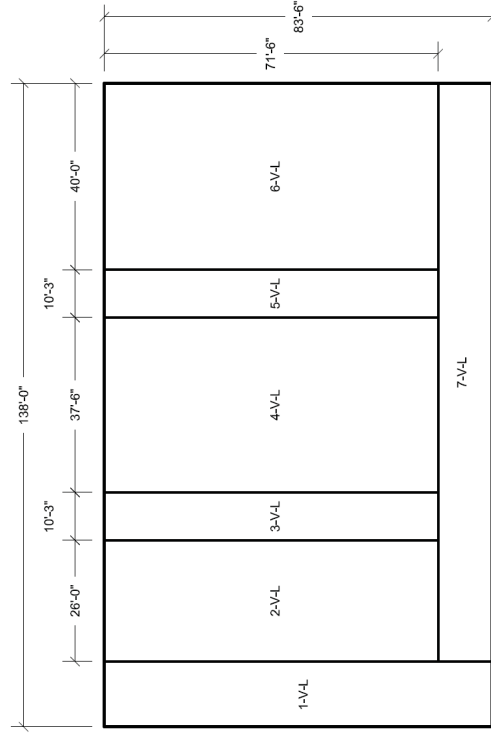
H.6-100: UHS BASIN WEST WALL LOOKING EAST
